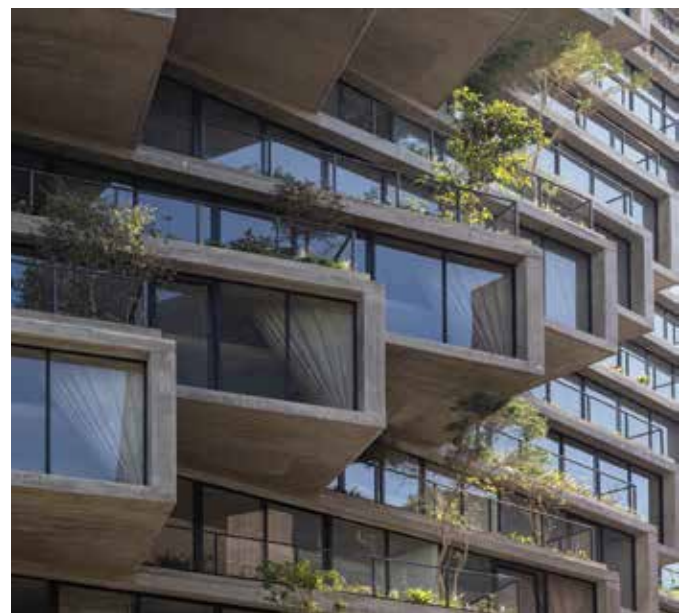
Planters were created by forming sculptural walls in the apartment below *(photo courtesy of BIG)
